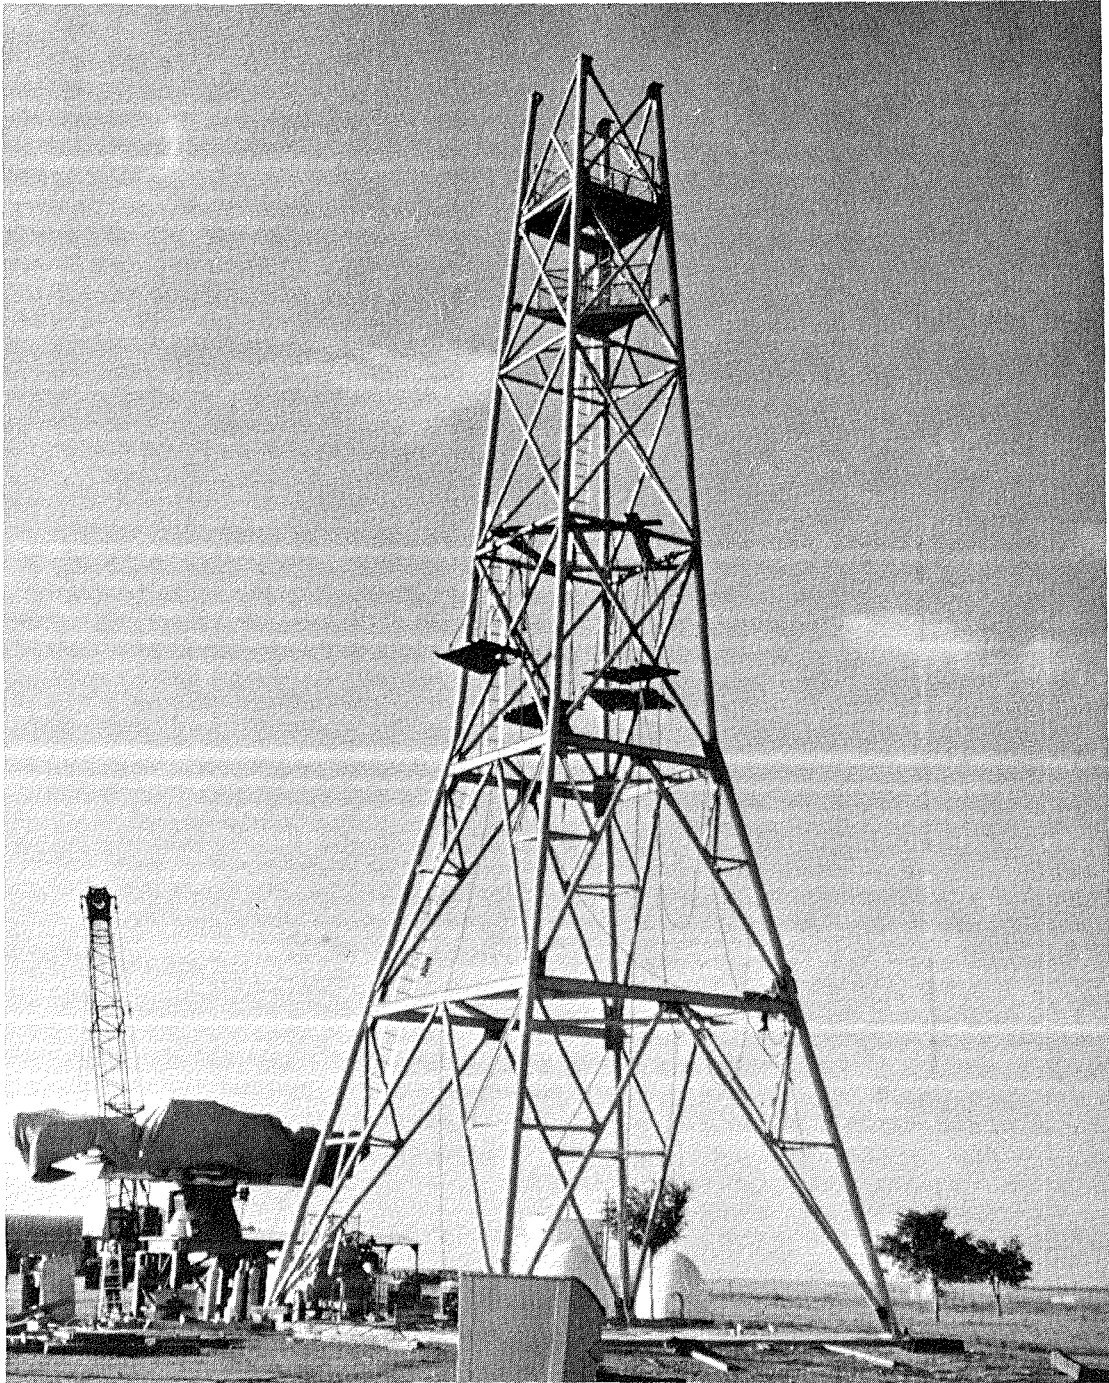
Installation of MOD-OA Tower on Foundation at Clayton, NM.
